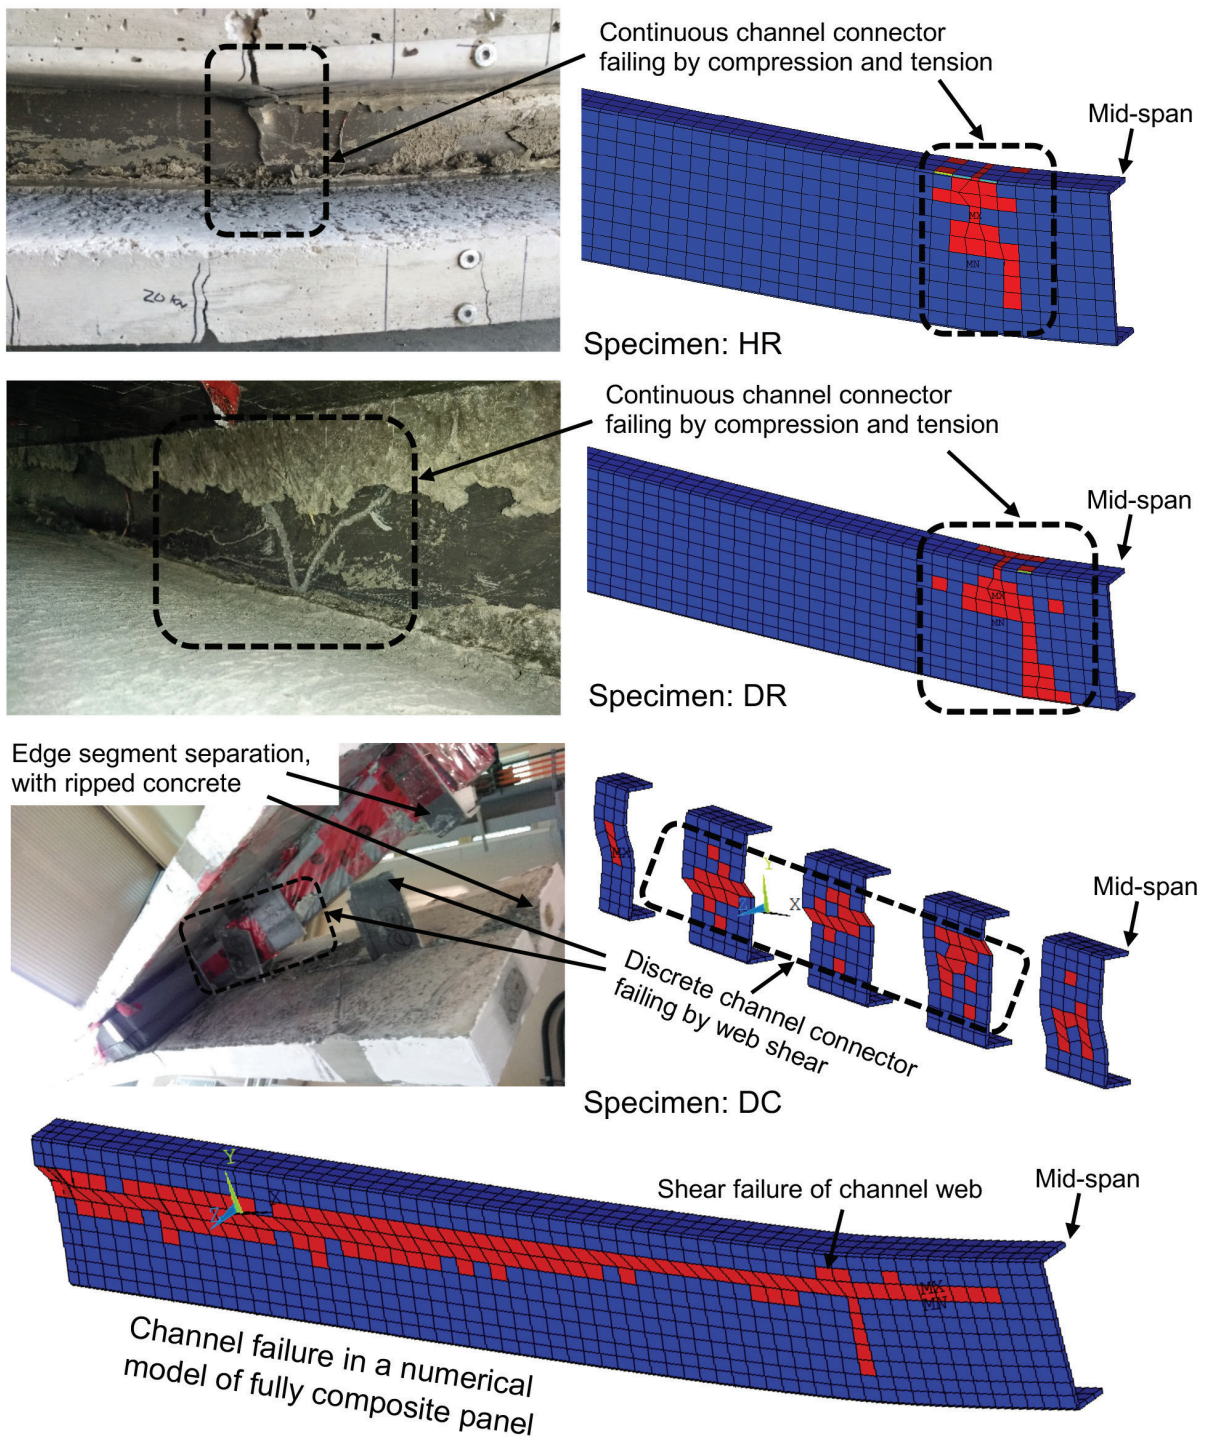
Channel connector failure modes, as observed in tests and predicted by finite element models (represented by the red colored elements and deformed shape). Note: DC = specimen with discontinuous GFRP shear connectors and a wythe reinforcement ratio equal to 0.34%; DR = specimen with continuous GFRP shear connectors and a wythe reinforcement ratio equal to 0.68%; GFRP = glass-fiber-reinforced polymer; HR = specimen with continuous GFRP shear connectors and a wythe reinforcement ratio equal to 0.17%.
